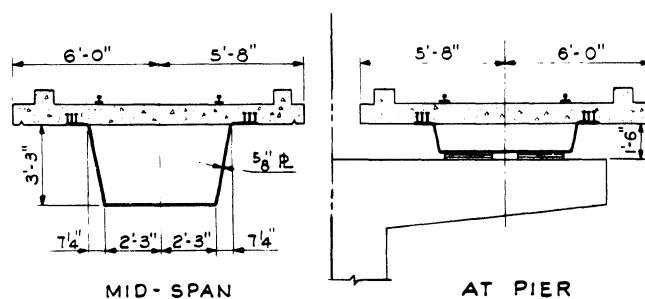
Proposed structure for elevated rapid transit system, San Francisco Bay Area. Span 85 ft. A single steel box girder with a composite cast-in-place concrete deck slab. The depth of box is reduced at pier supports. When superelevation is required, unequal web depths are used at the supports
